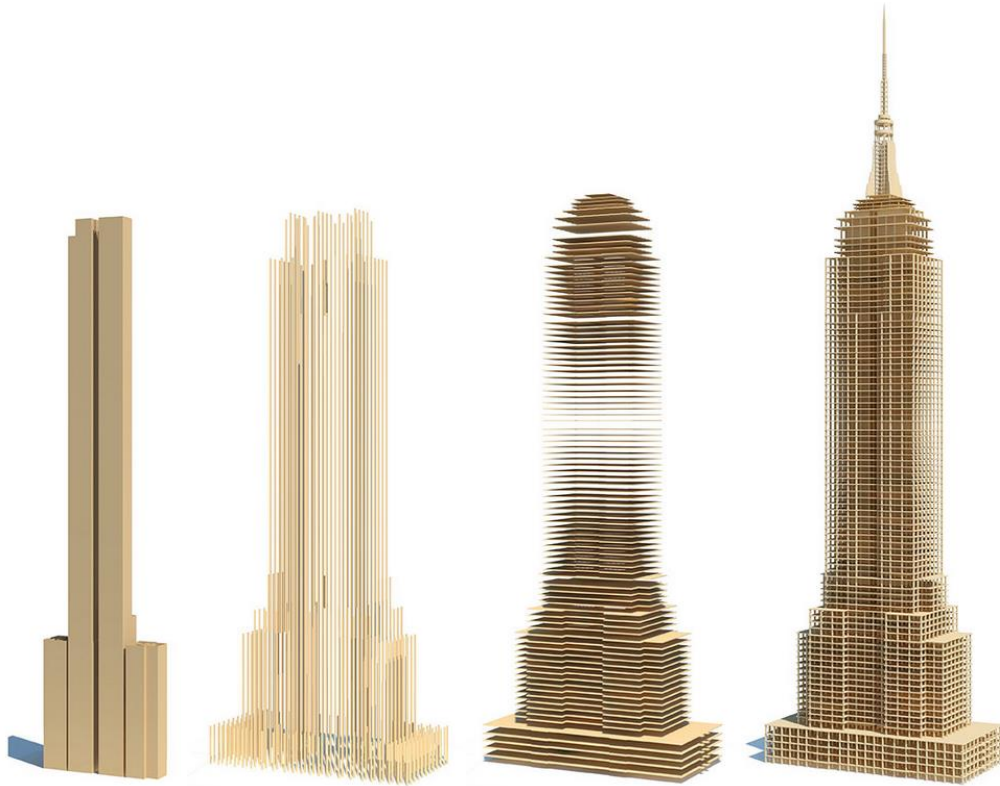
The timber redesign features LVL core units, columns, floor slabs and shear walls [21].
